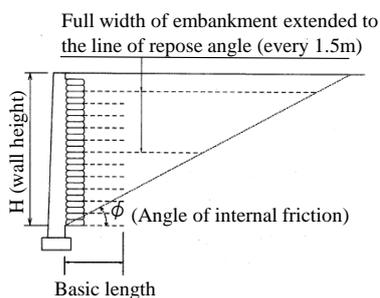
Standard arrangement of geotextile reinforcement
